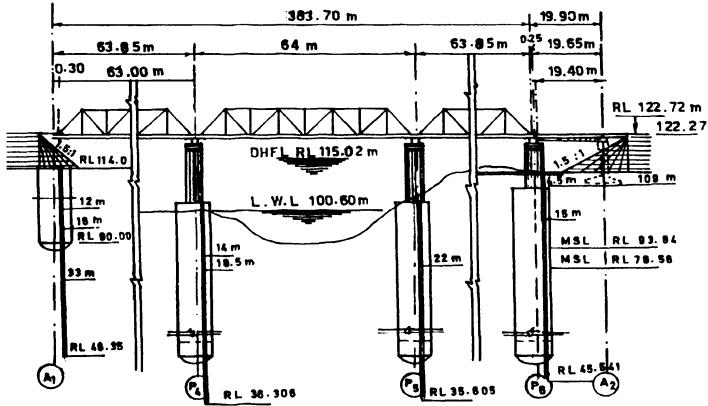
LONGITUDINAL ELEVATION OF BRIDGE
